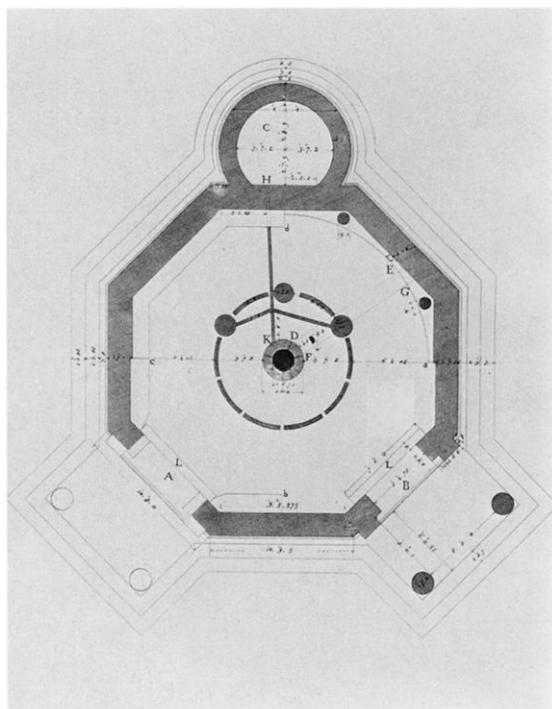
Floor plan: Stuart and Revett, pl. 111
